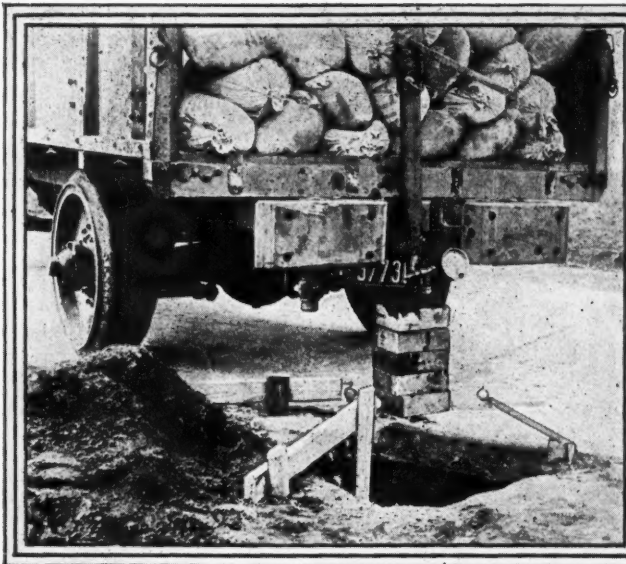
Determining deflection of concrete slab with subsoil excavated
